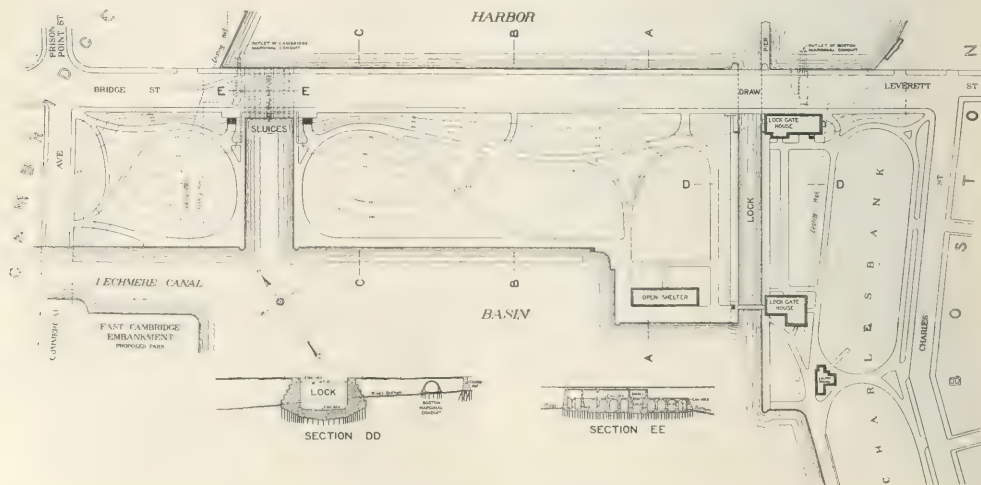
GENERAL VIEW OF DAM AND LOCK
